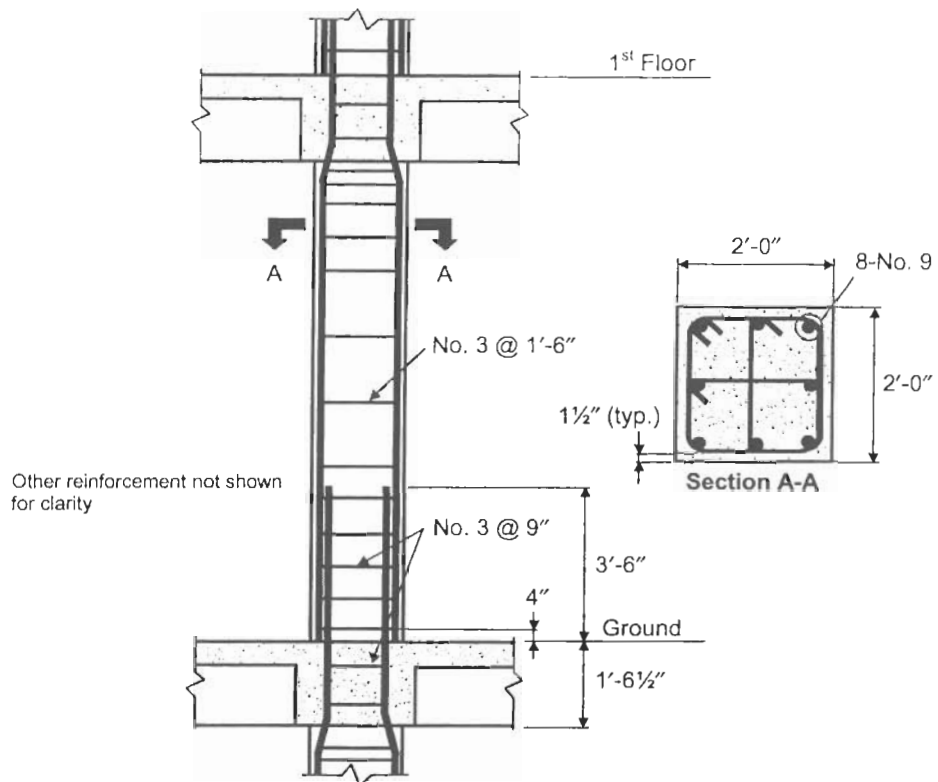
Reinforcement Details for Column C3 Supporting the 1<sup>st</sup> Floor Level (SDC C)
